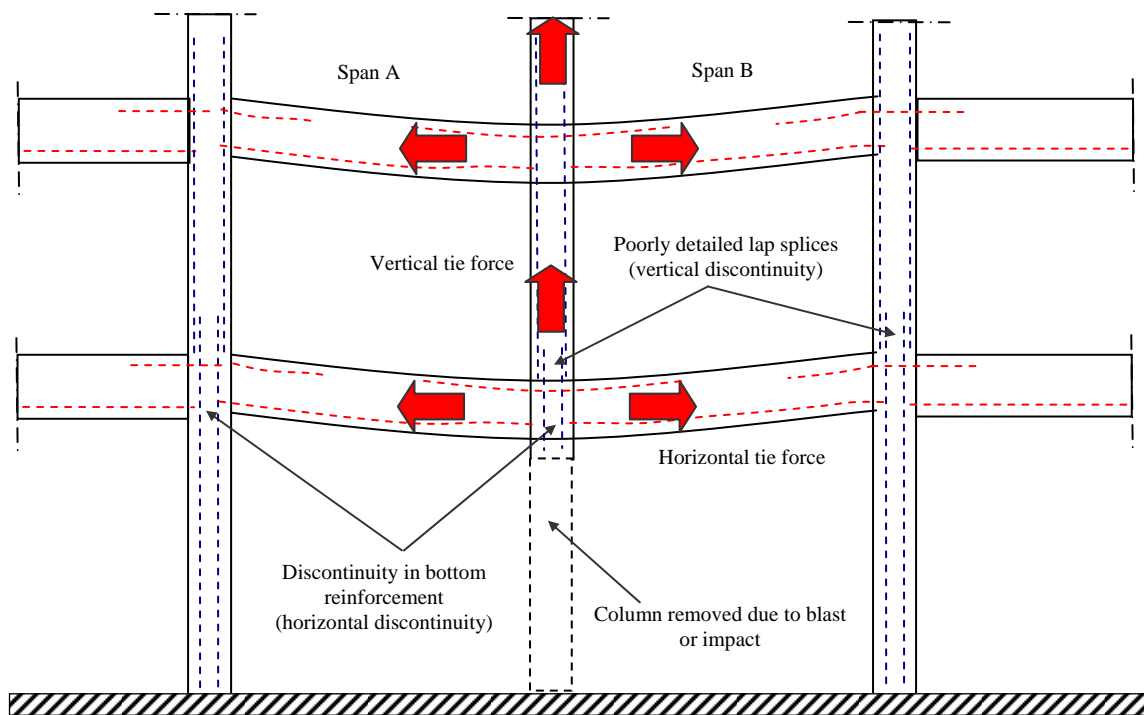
Discontinuities in existing reinforced concrete structures
